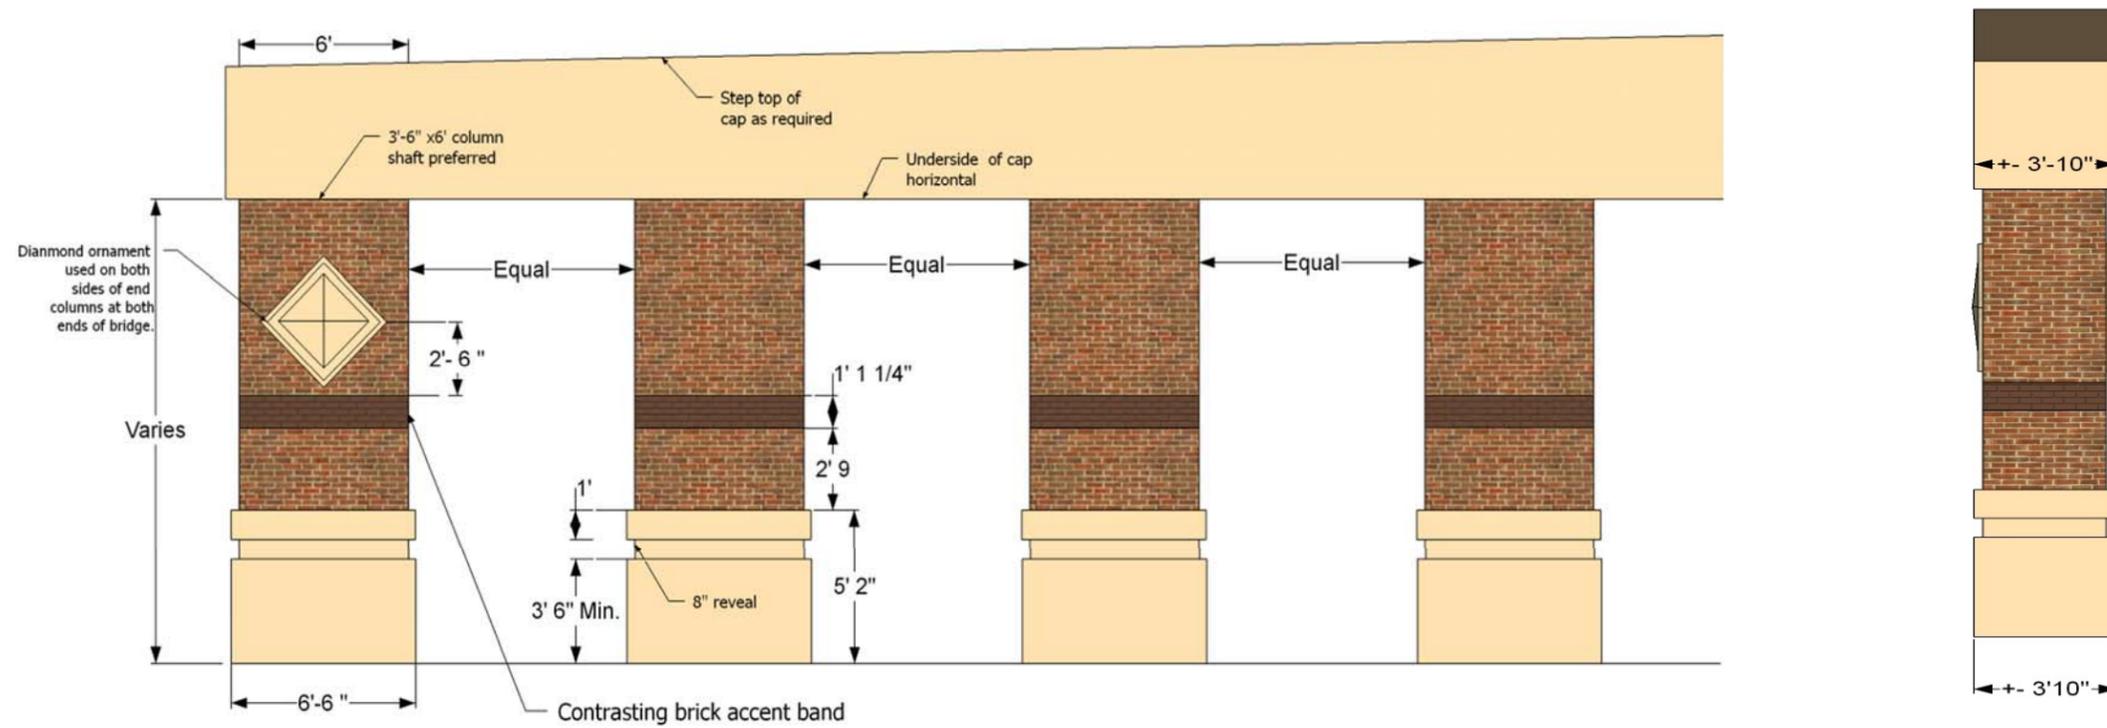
Partial Elevation View Main Line Multi-Column Pier with Crash Wall
